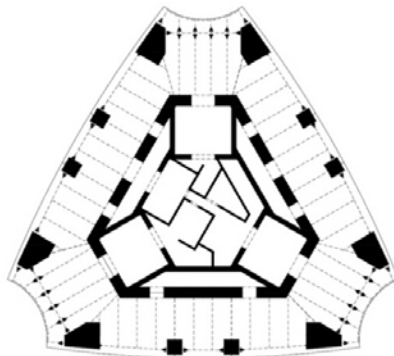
Typical layout plan of Dalian Greenland Center (Source: Guangjing Sha)
